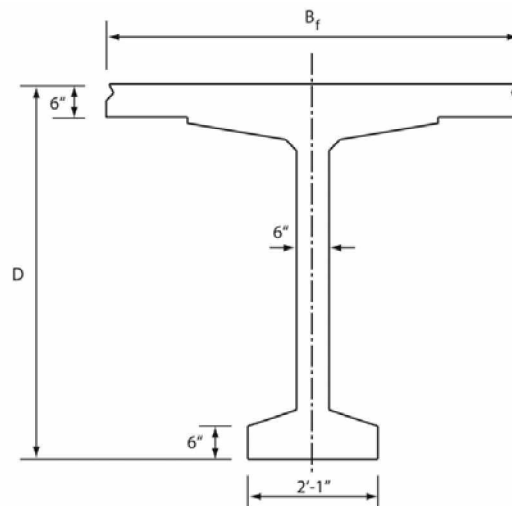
Standard Alaska-Style Precast DBT Girder Section (ADOT&PF 2017)
